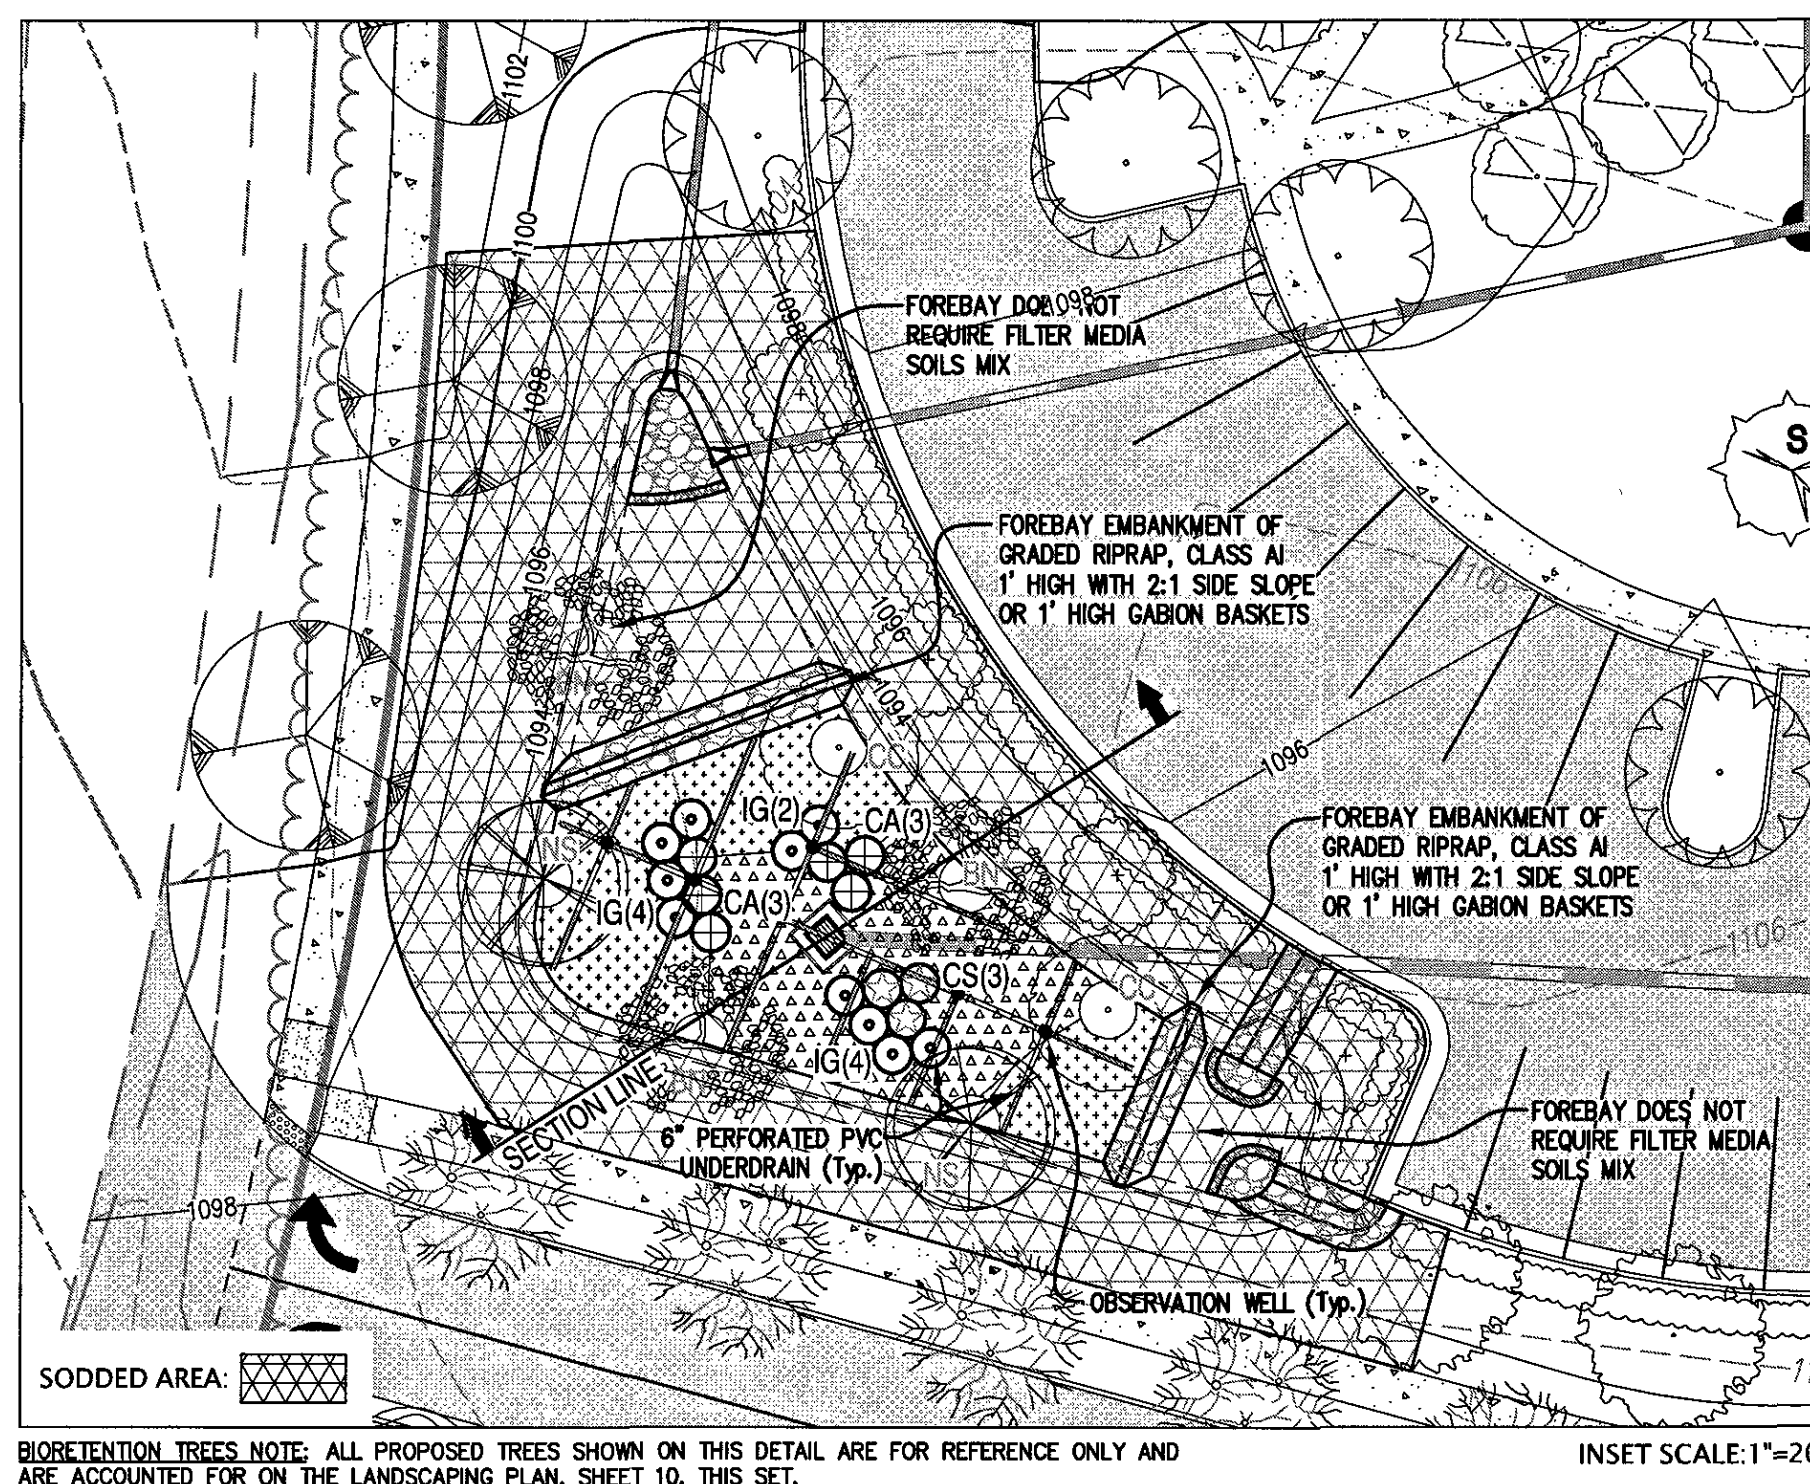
TYPICAL DETAIL OF BIORETENTION WITH PONDING
